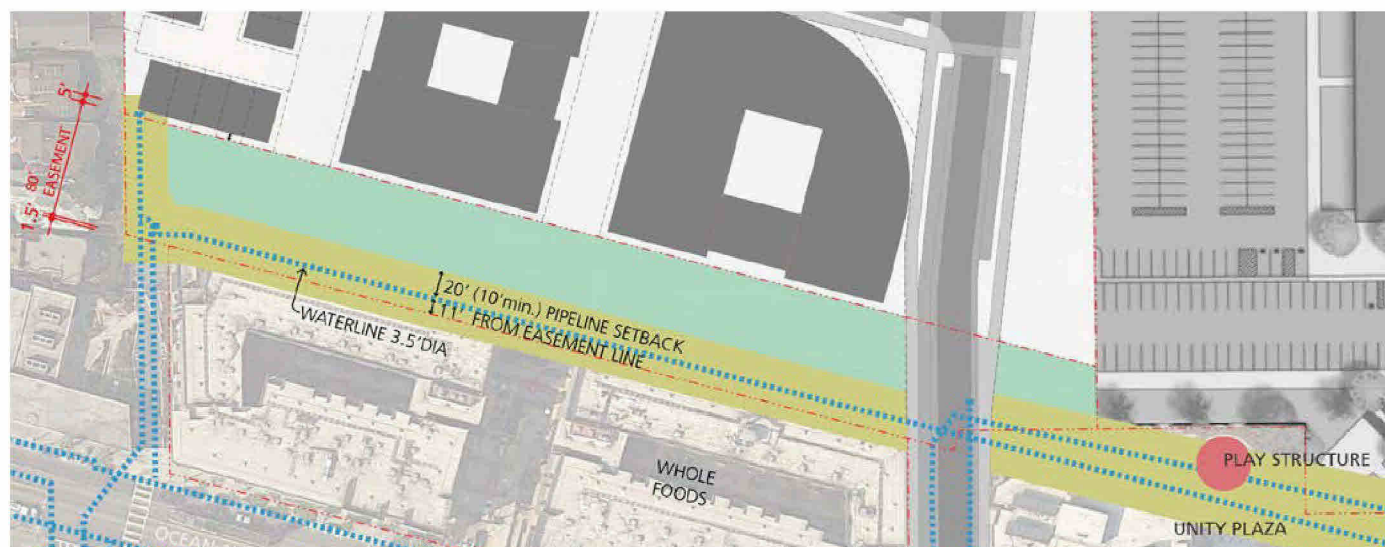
PUC Open Space Existing Site Constraint Diagram
